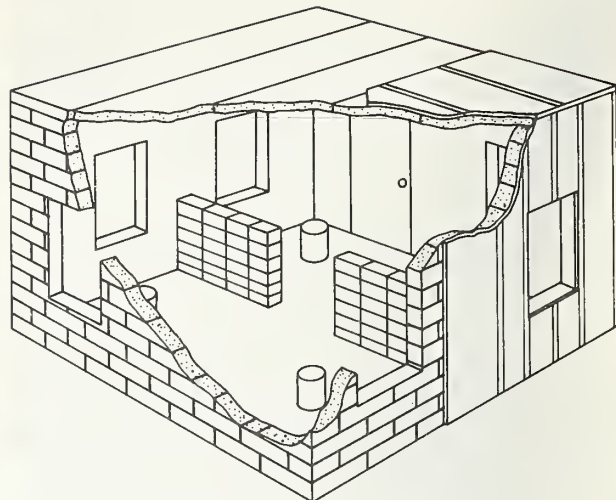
The experimental building showing windows, internal mass, heaters, and insulation on the outside of the building.
